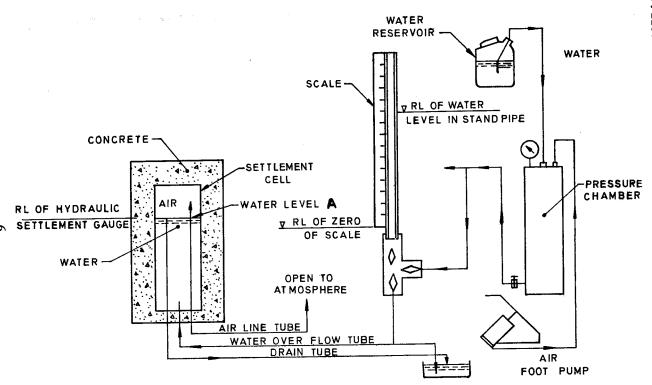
Details of Installation of Single Point Hydraulic Settlement Gauge
